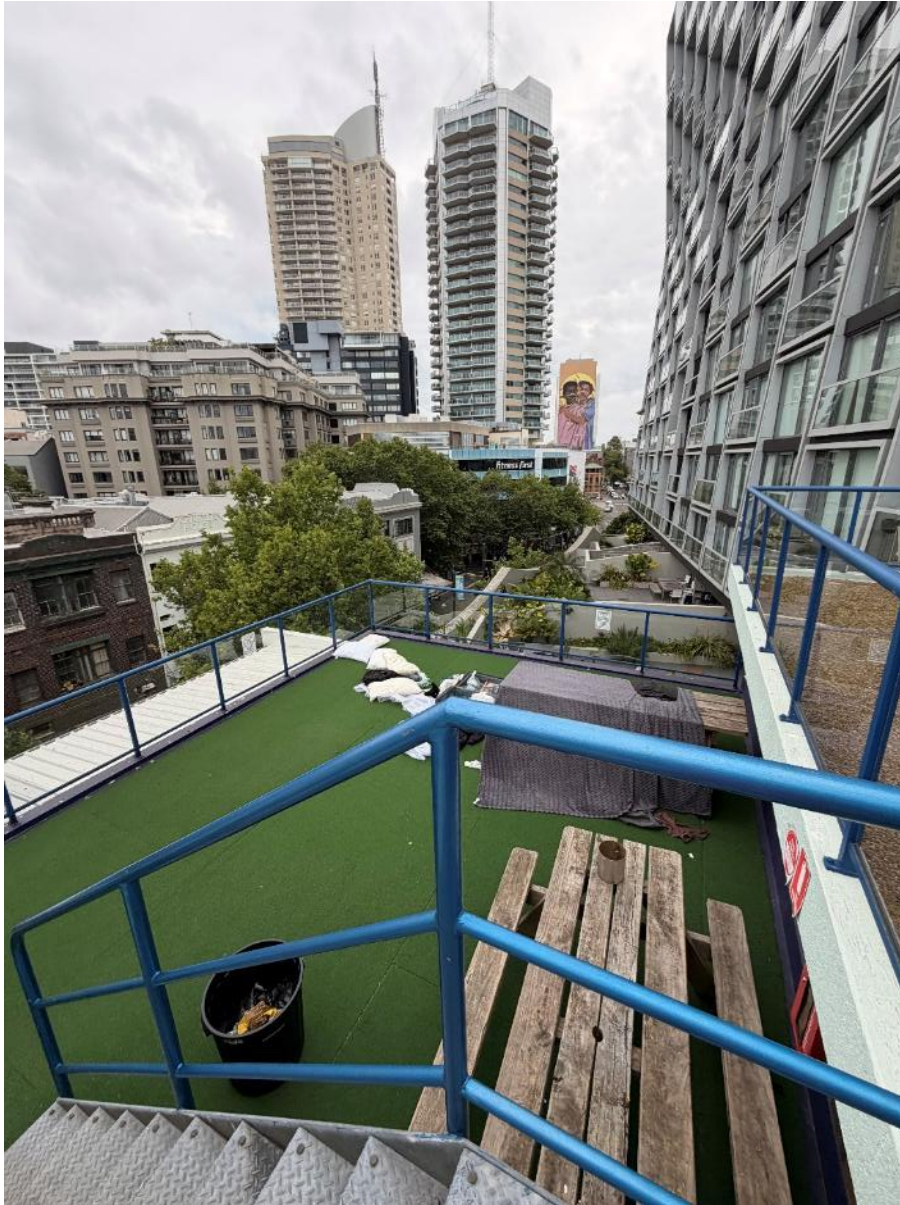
Eastern side of existing rooftop terrace at the front of the building looking south
